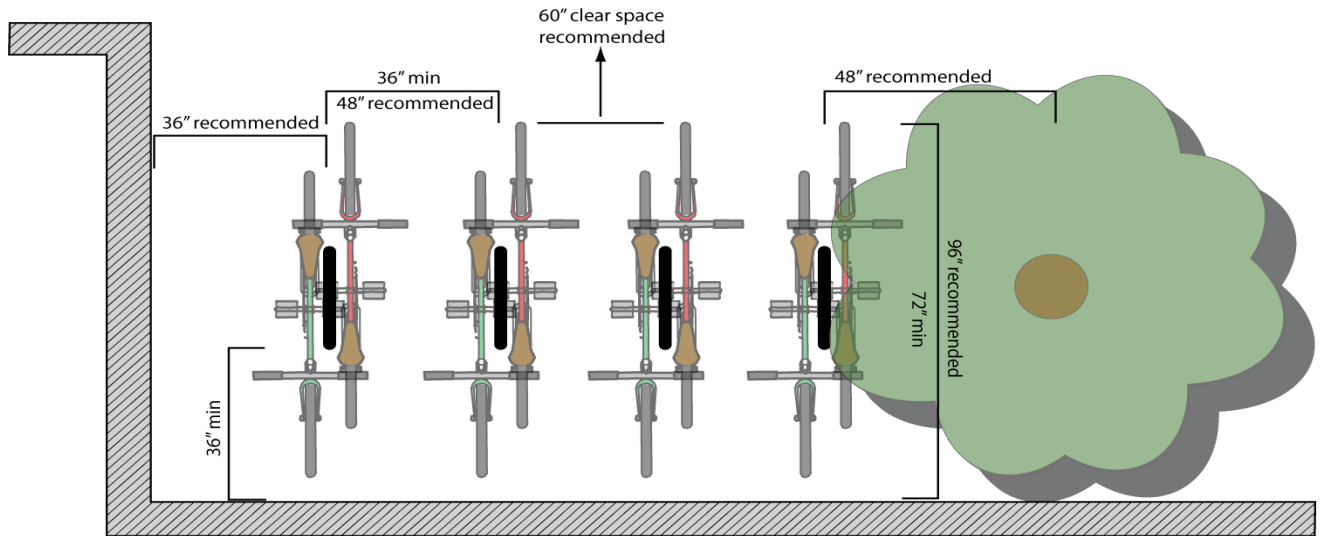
Short-Term Bike Parking Installation Guidelines
